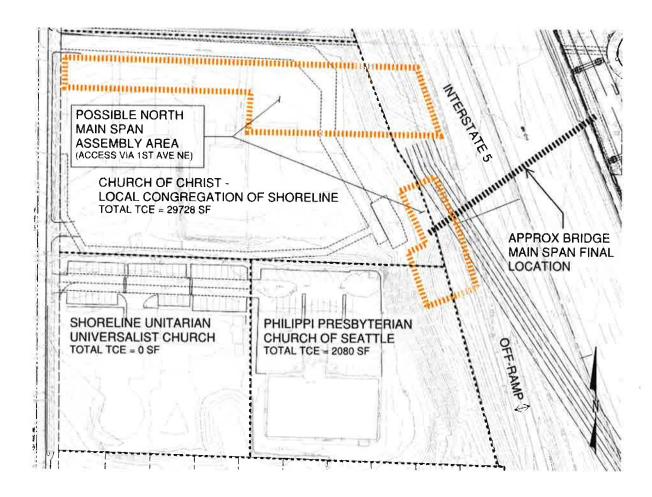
Potential Bridge Construction Staging Area on Church of Christ Parcel
